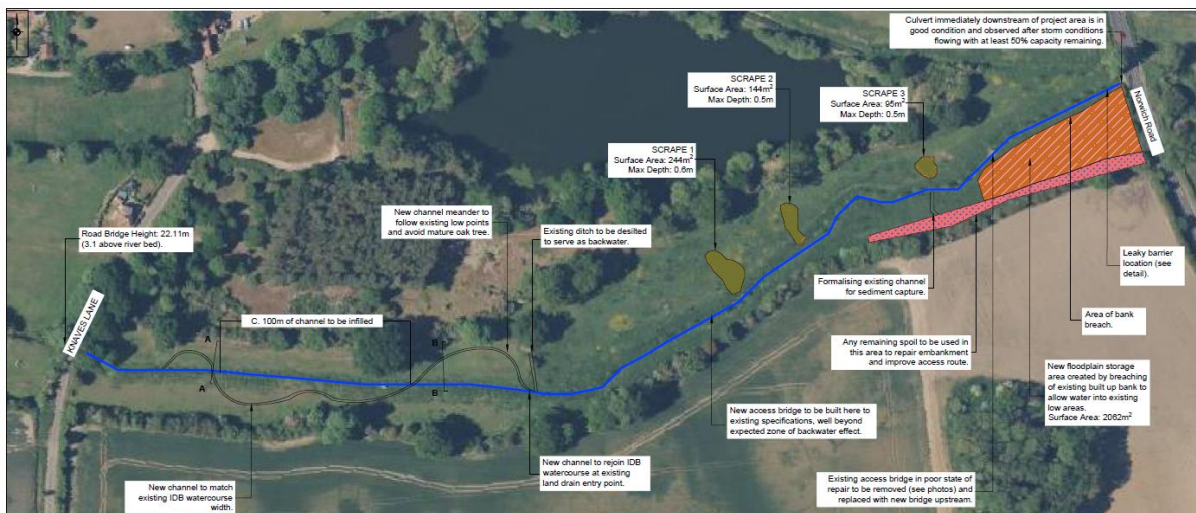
Drawing provided by applicant: 'Overview plan and new channel cross sections', River Waveney Trust, RWT/2023/200/001 Rev O, 07/11/2023.
